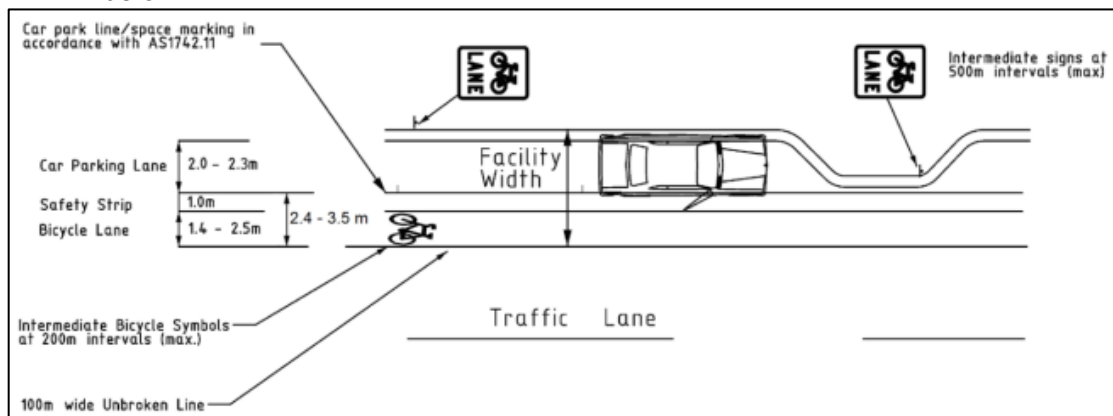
AUSTRROADS Excerpt - Figure 4.47 Example of bicycle/car parking lane layout (parallel parking)
